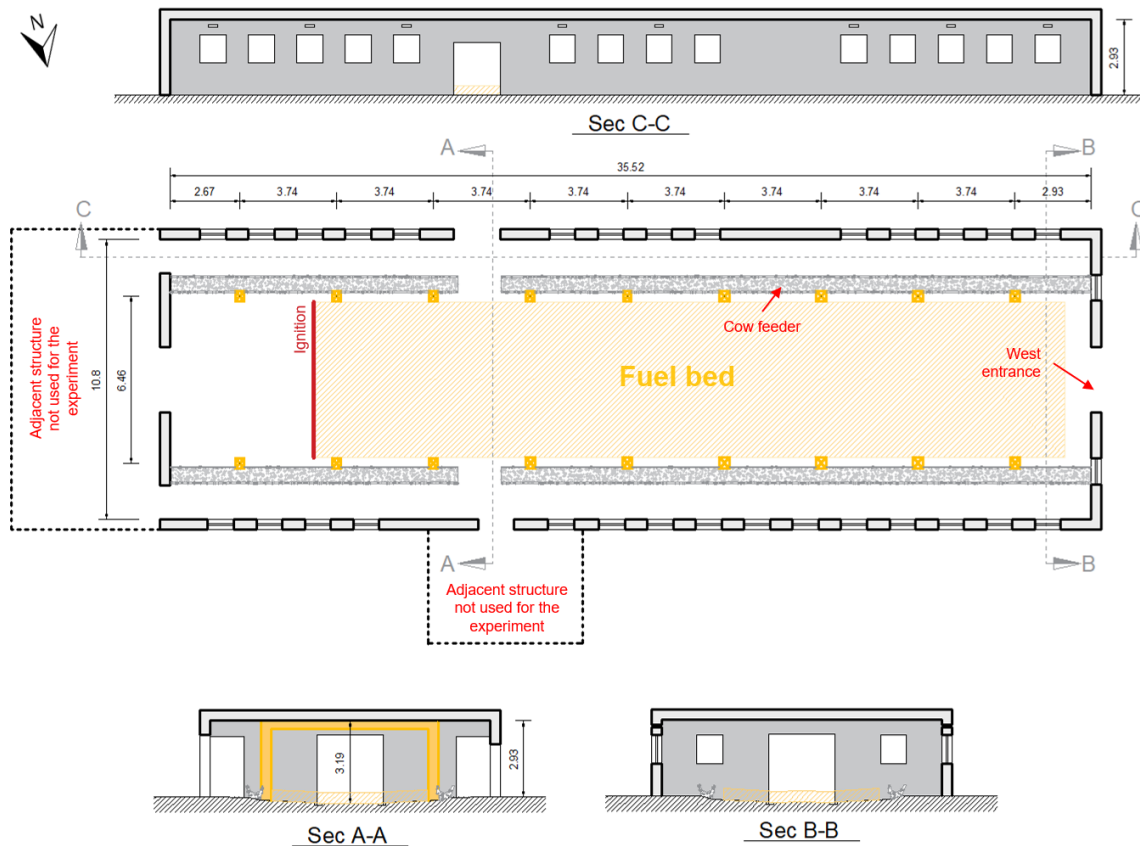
Floor plan and sections of the compartment used for x-ONE [91] and x-TWO experiments.
